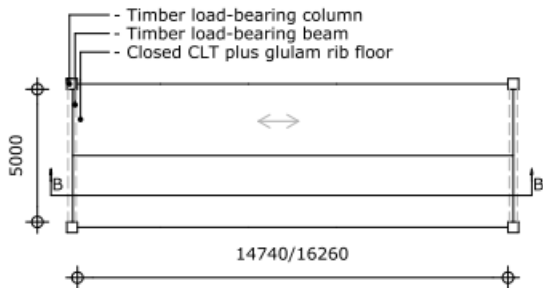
Top view floor design 2 closed CLT plus glulam rib floor in mm
